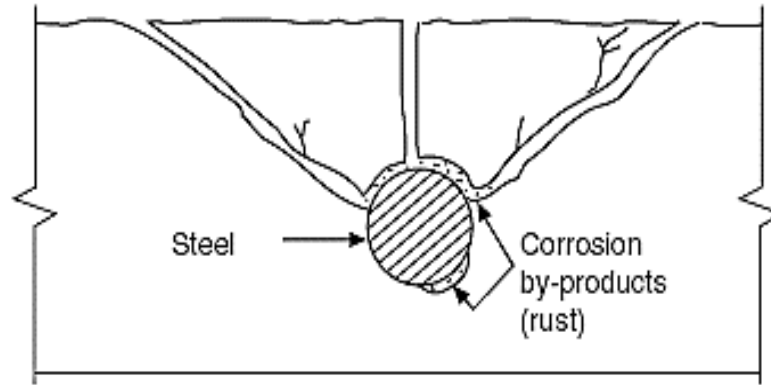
The expansion of corroding steel creates tensile stresses in the concrete, which can cause cracking, delamination, and spalling.
